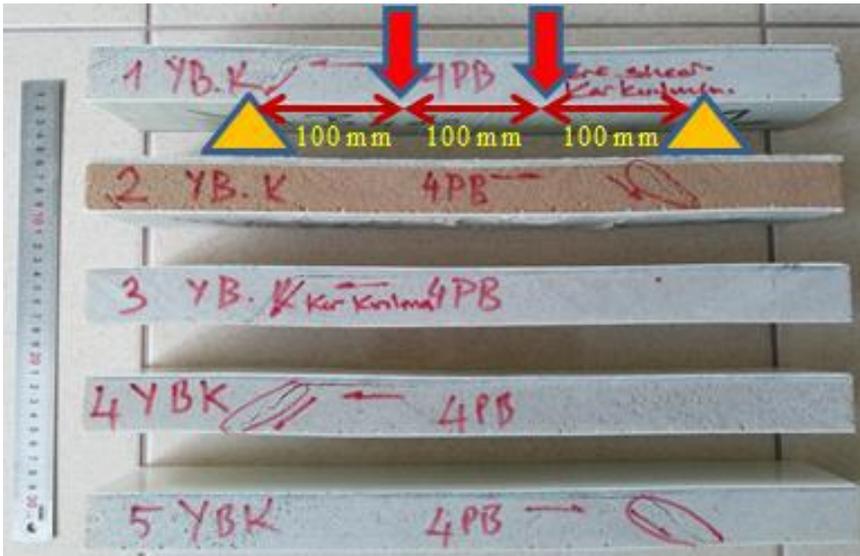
Failure modes of freeboard sandwich beams under flexural-up loading.
